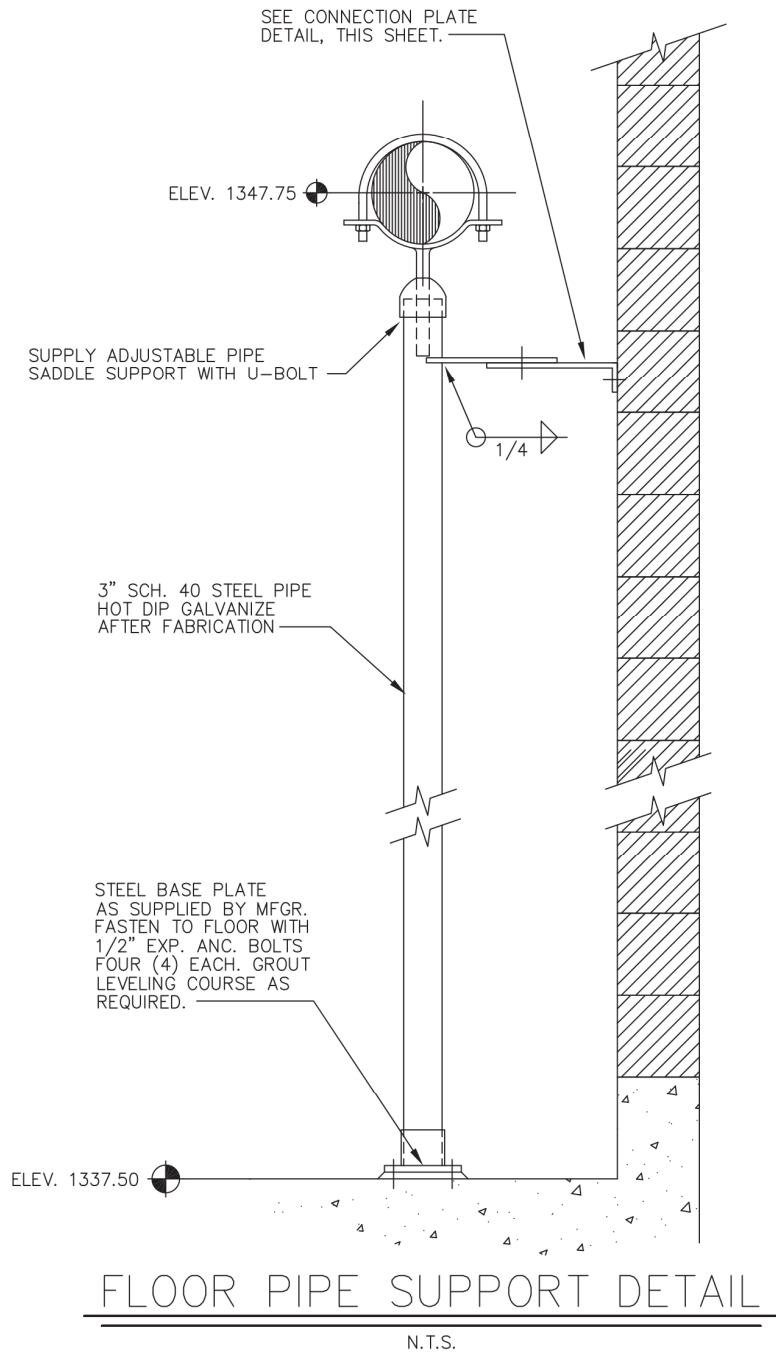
A section or elevation view of a floor-mounted piping support.
